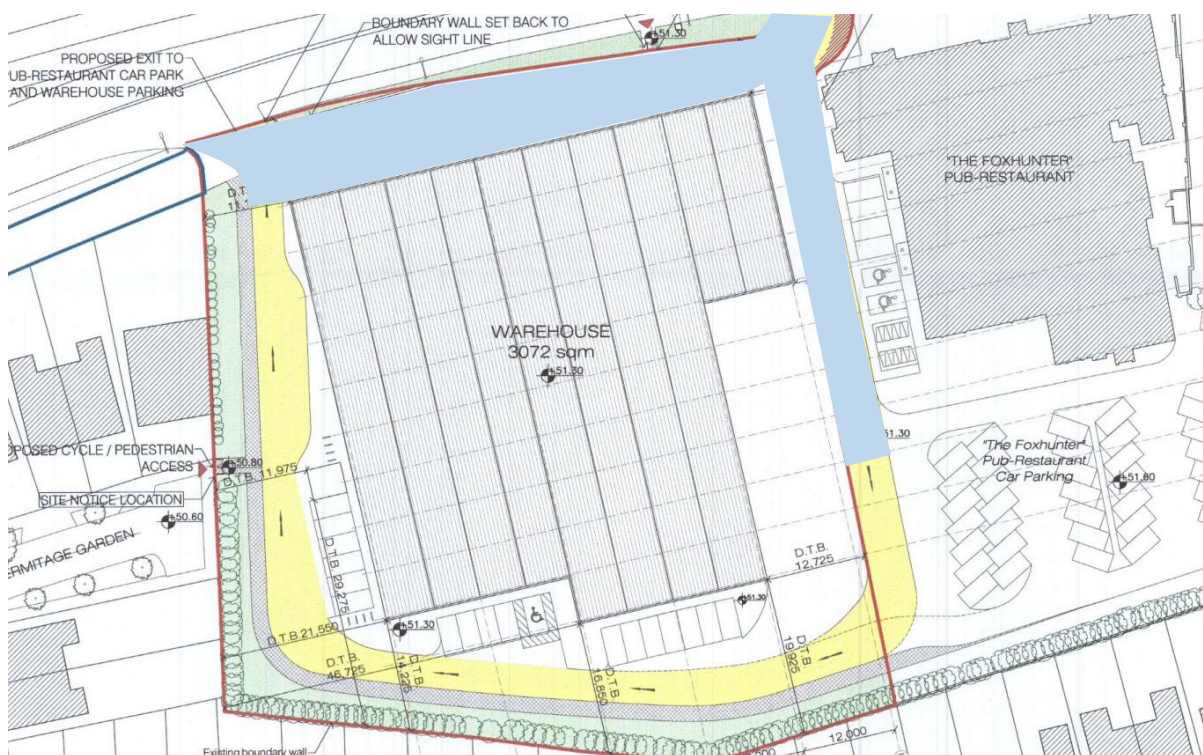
Extract of proposed site plan with a preferred option (blue shading) for access and entry which would impact on surrounding dwellings to a lesser degree.
